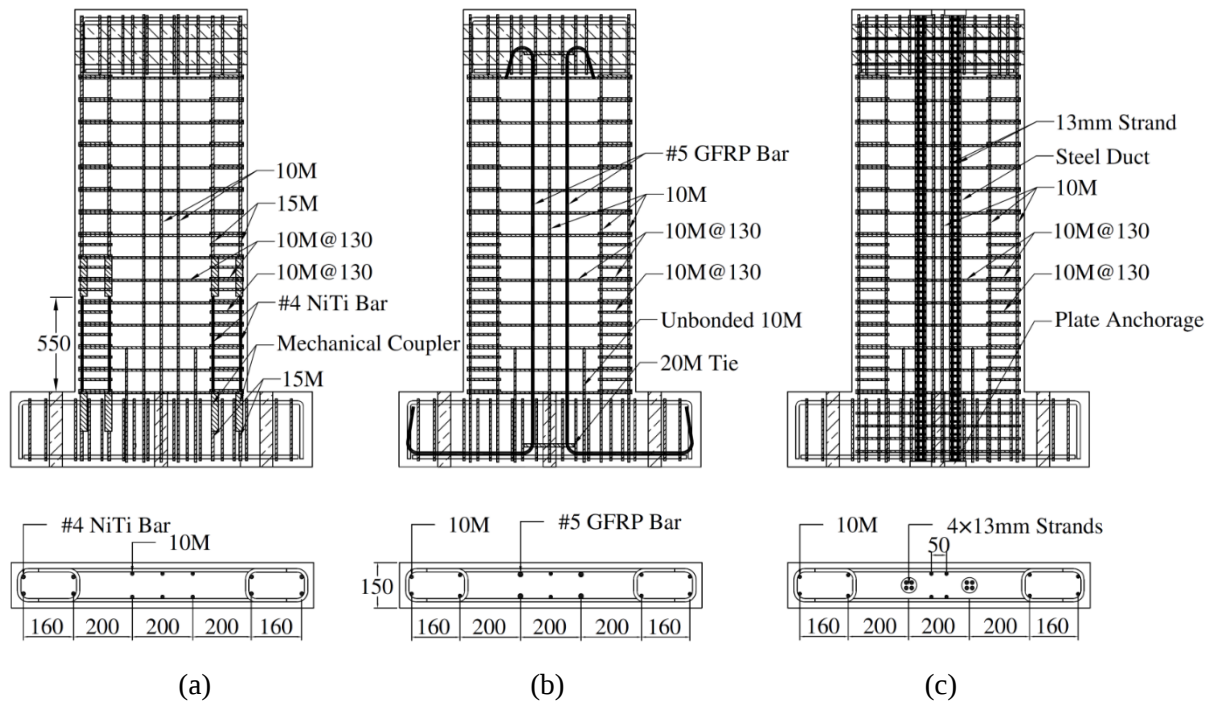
Elevation and cross-section of walls (Kian and Cruz-Noguez, 2018): (a) SMA wall, (b) GFRP wall and (c) PPT wall
